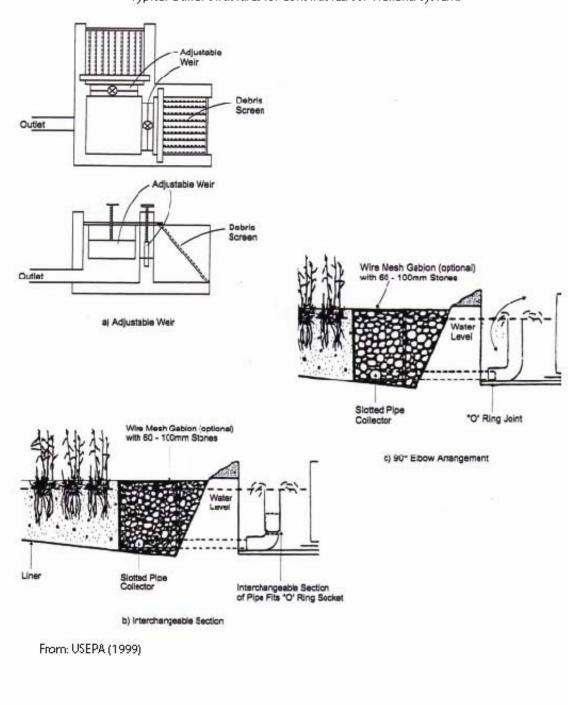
Typical Outlet Structures for Constructed SSF Wetland Systems
